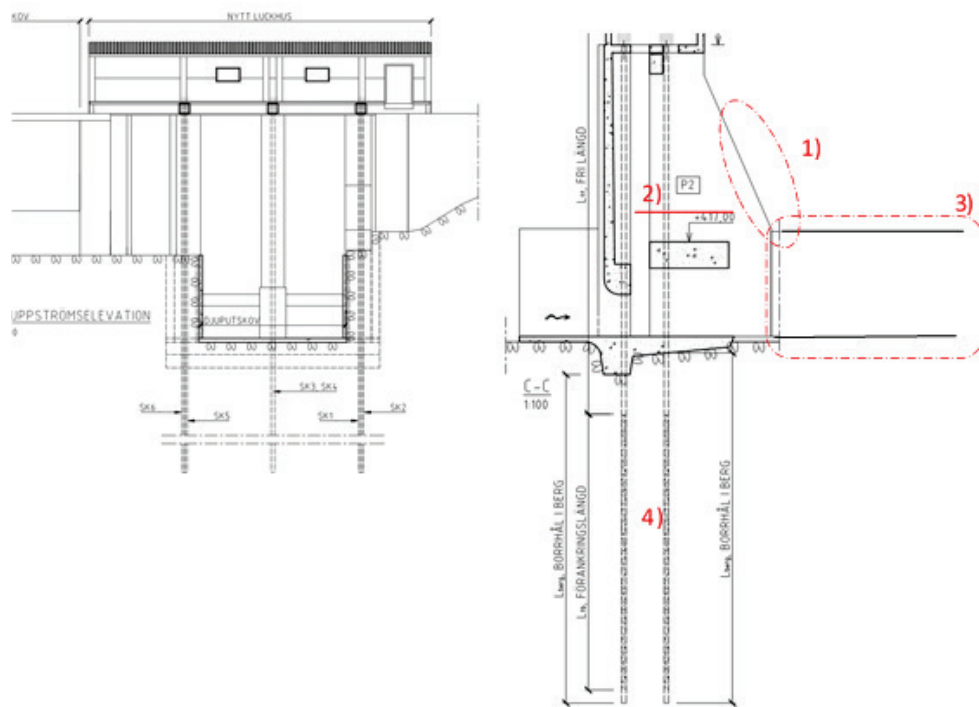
Upstream view and cross section (2015). 1) = crazing/cracks in the downstream side of the spillway piers, 2) = horizontal through-going cracks in the piers, 3) = cracks/crazing in guide walls.
